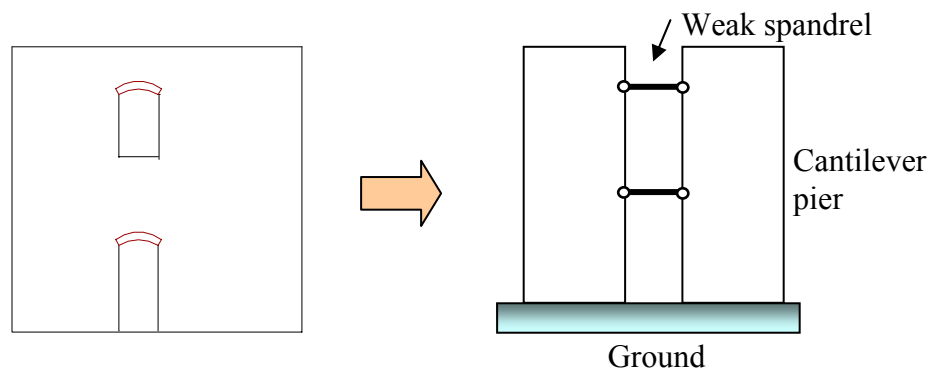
Solid pier-cracked spandrel perforated URM wall model
